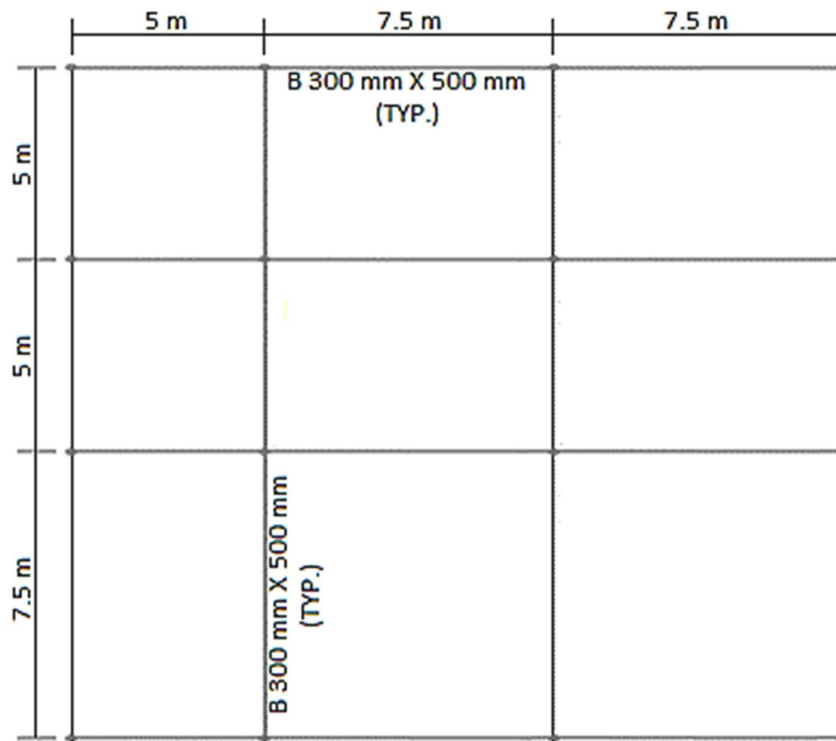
Ground, 1st, 2nd and 3rd floor plan of the building with vertical irregularity
